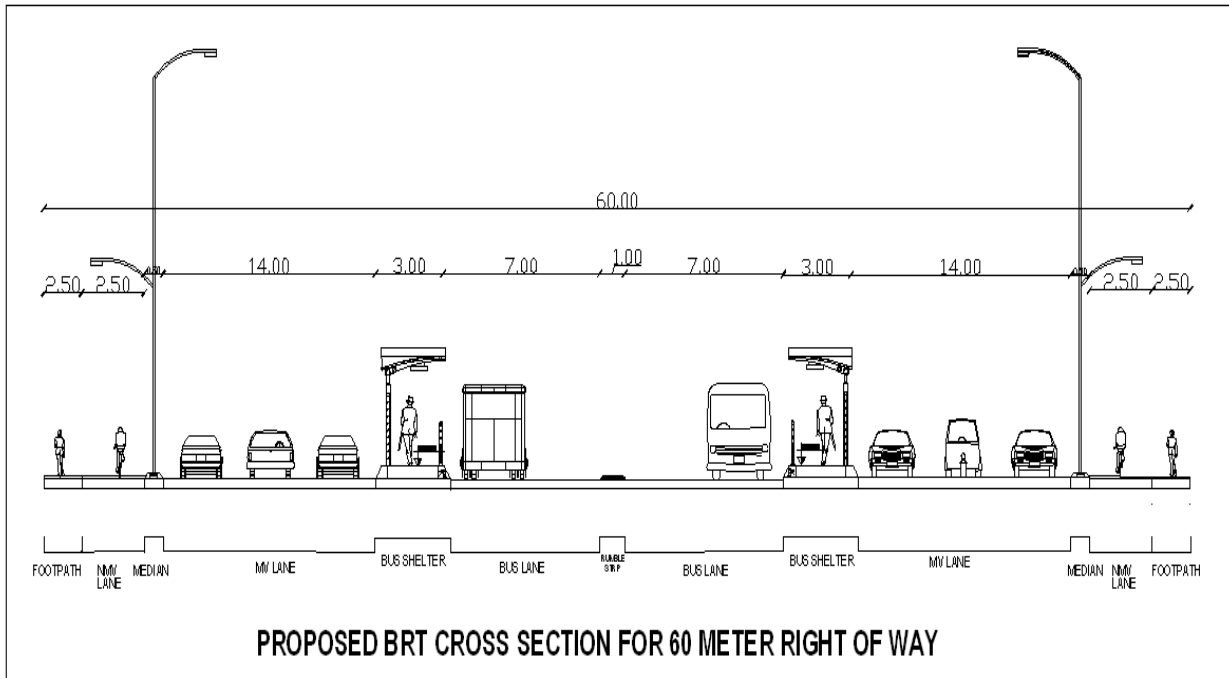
Typical Cross-Section of Ring BRT on 60 M (ROW)
